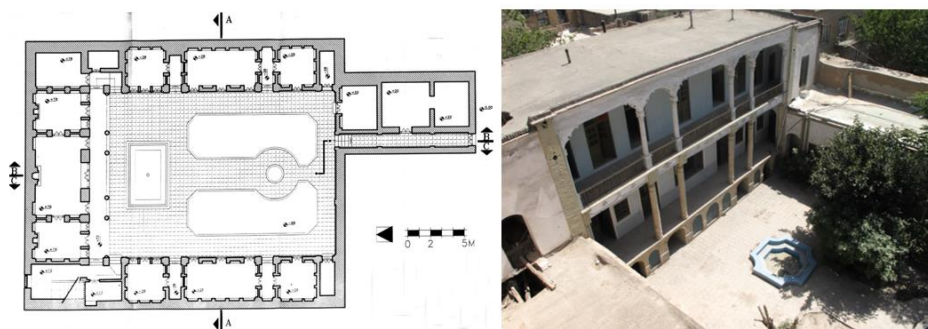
Motamen Al Ateba House an example of Qajar Houses in first period (Photo by Author).
